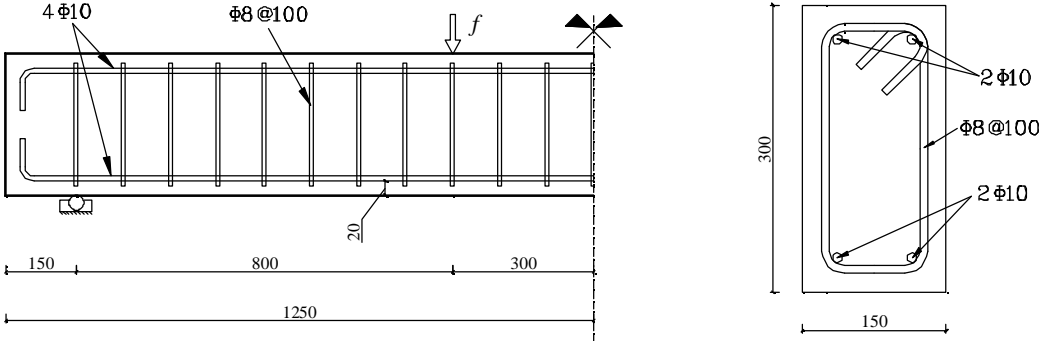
Geometry and steel arrangements of the as-built beam (dimensions in mm)
